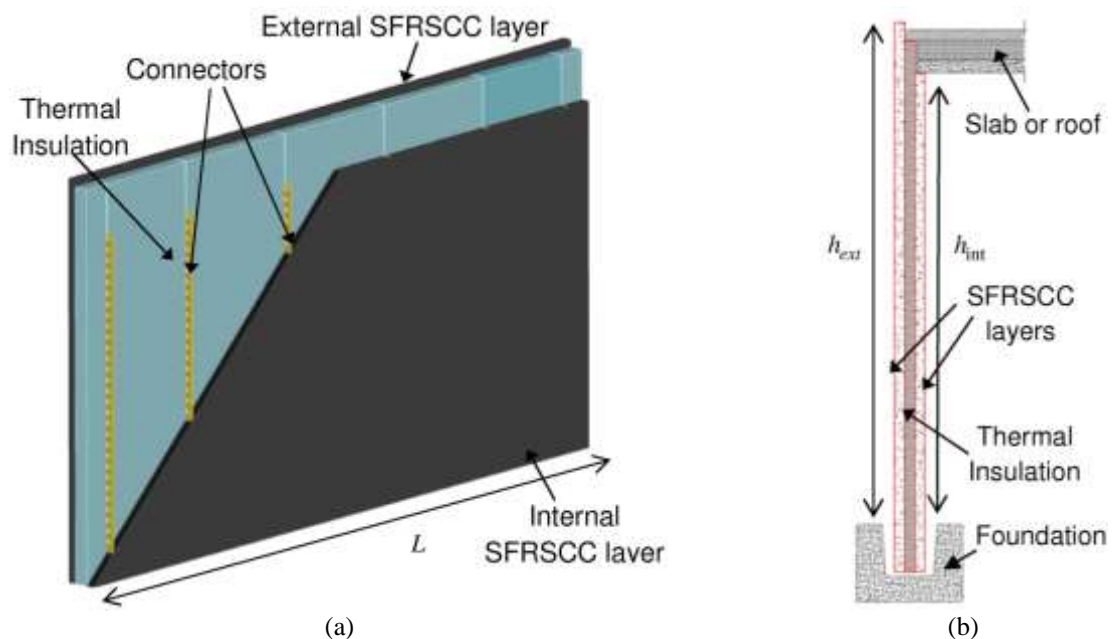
Constitution of the sandwich panels of LEGOUSE building system: (a) Components of the devised load-bearing sandwich wall panel; (b) System cross section [2], [3].
